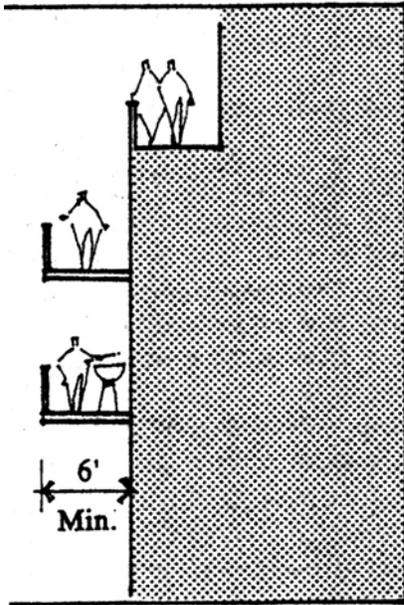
Typically, balconies and rooftop decks should be 6' deep to be truly usable.
